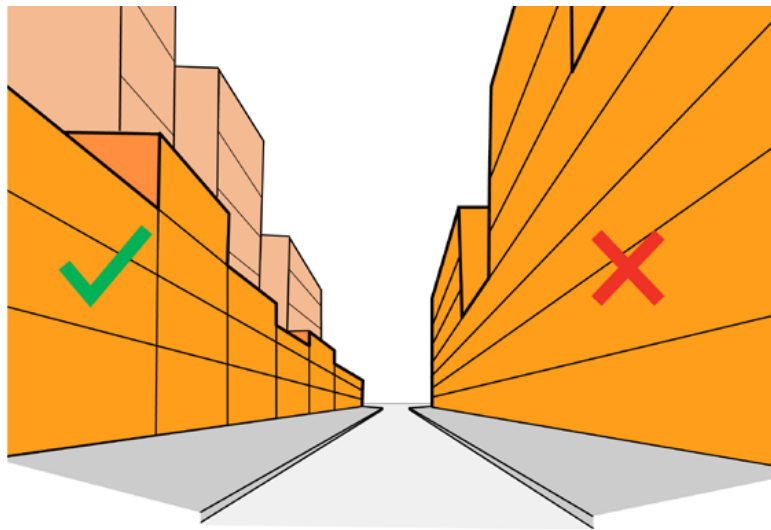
Preferred minimum setbacks above the preferred maximum street wall from a street
